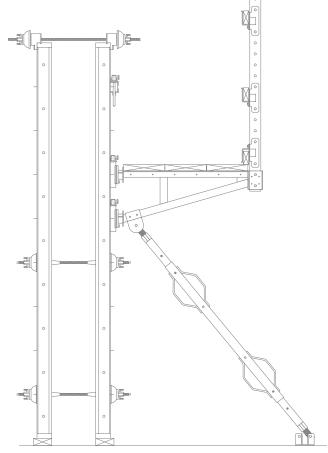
Walkway Bracket Attached To Standard 9' High Panel Inner Rails With Pipe Brace Attached To Walkway Bracket
